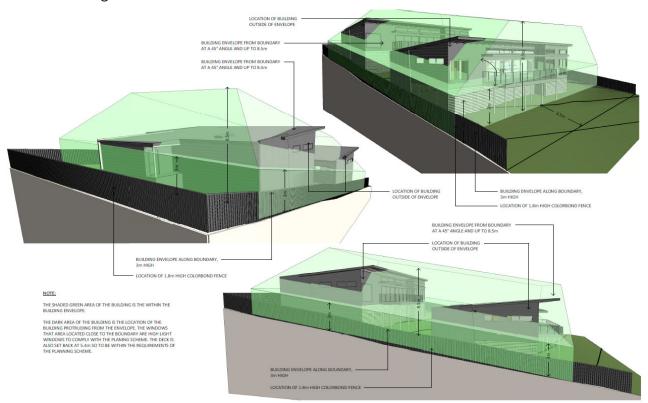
Multiple dwelling development plans showing permitted building envelope – 19 Leary Avenue, Stony Rise (<u>Source</u>: Supplied - PA2019.0149).
